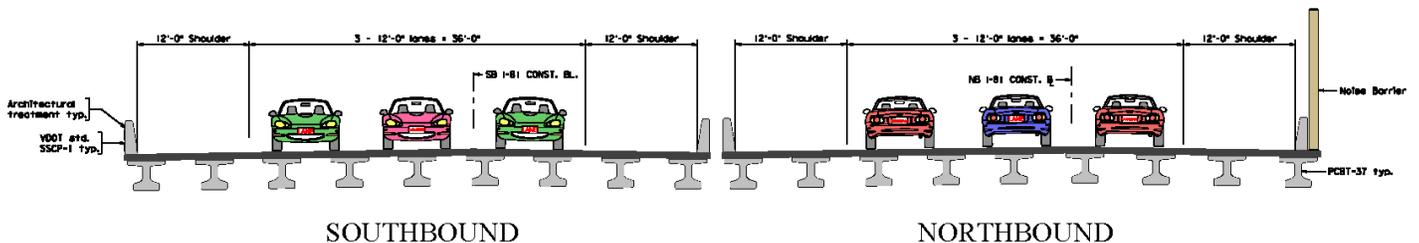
Transverse Section - I-81 Over Route 635 (Goodwin Avenue)
